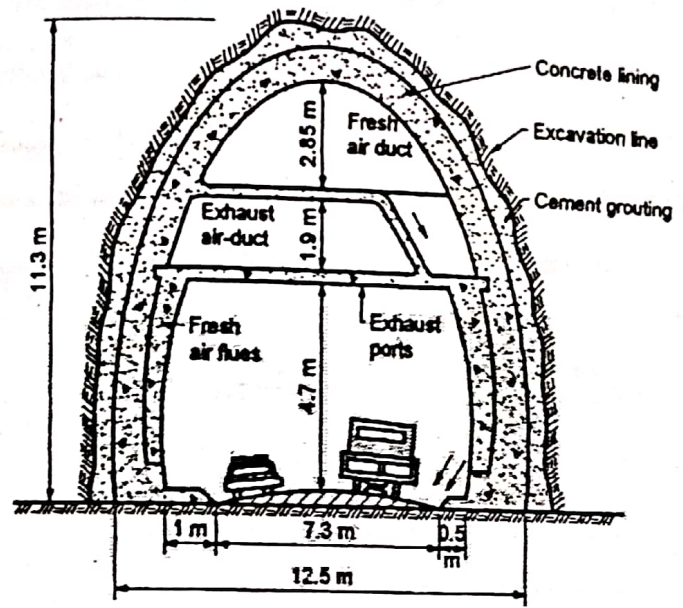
Cross-section of tunnel for a national highway
